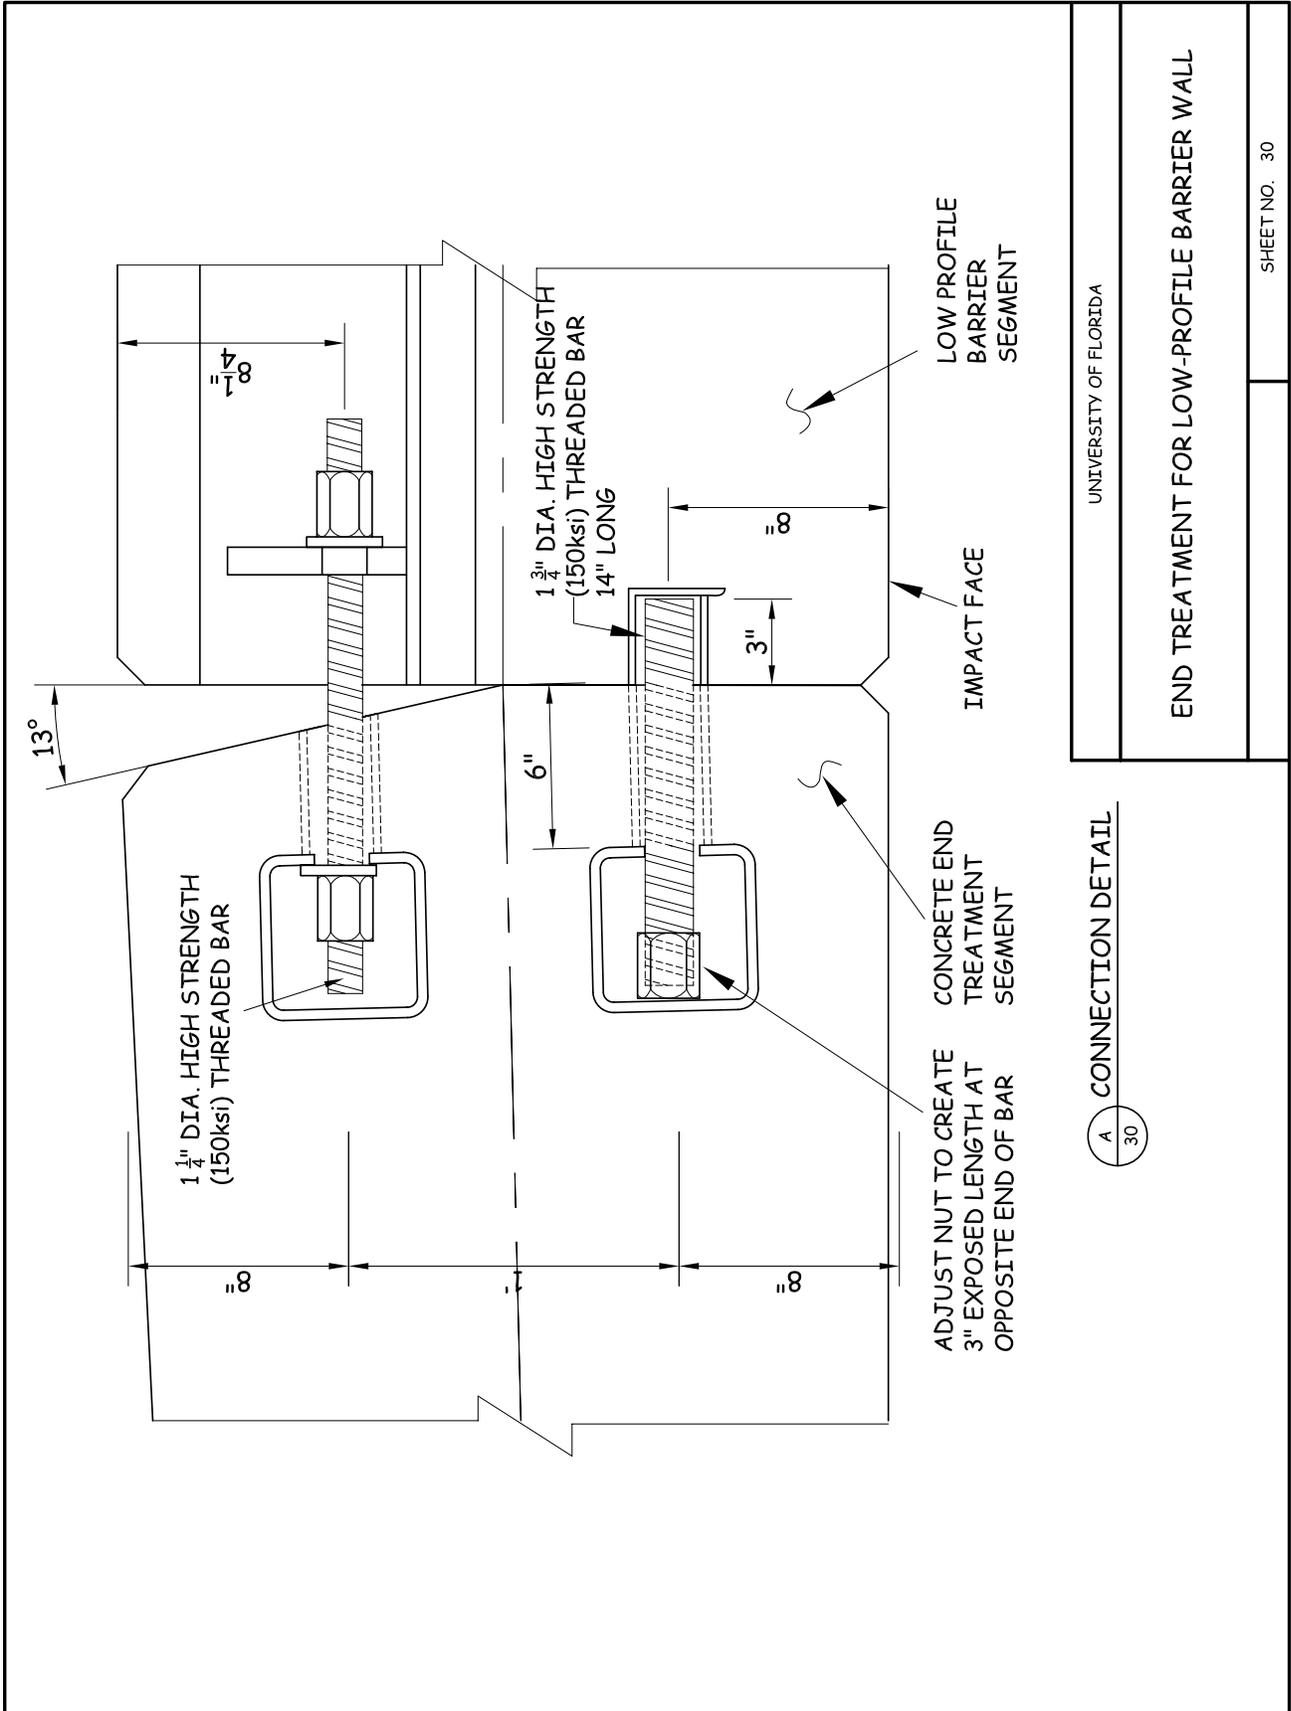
Drawings of Florida Concrete Curb End Treatment (14 of 14)
